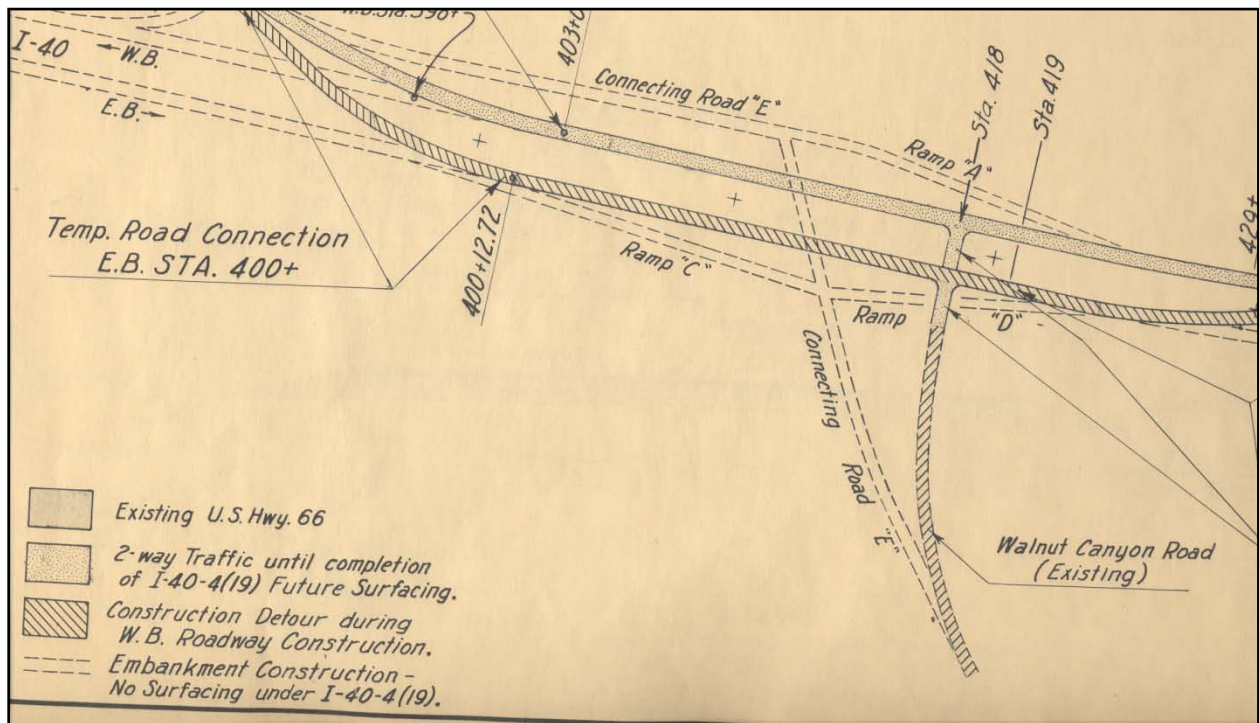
Detail of construction plans for Walnut Canyon-Interstate 40 interchange and realignment of Walnut Canyon Approach road, 1963 (NPS files).
